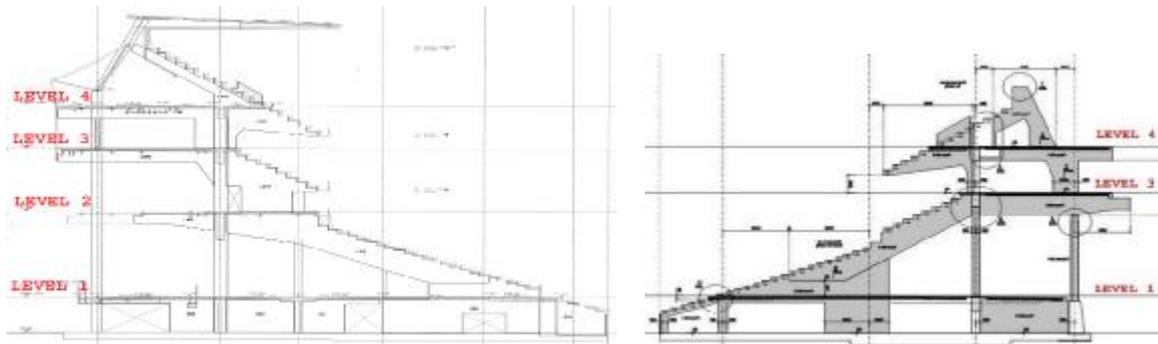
East-west cross-sections through main stands (Paul Kelly – left, Deans – right)
